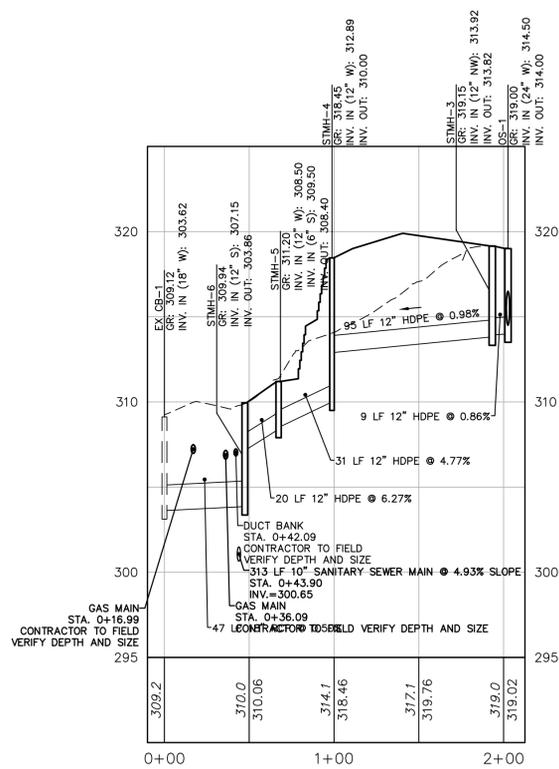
DETAILED GRADING, DRAINAGE AND UTILITY PLAN
